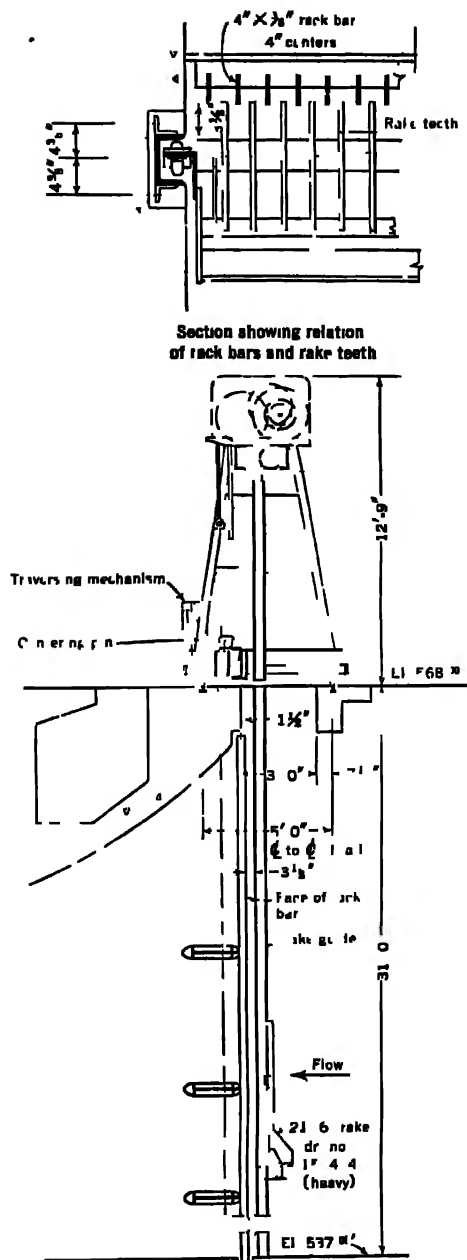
Arrangement of Newport News rack rake which disposes of raked trash through a sluice Winfield plant of Kaniwha Valley Power Co
